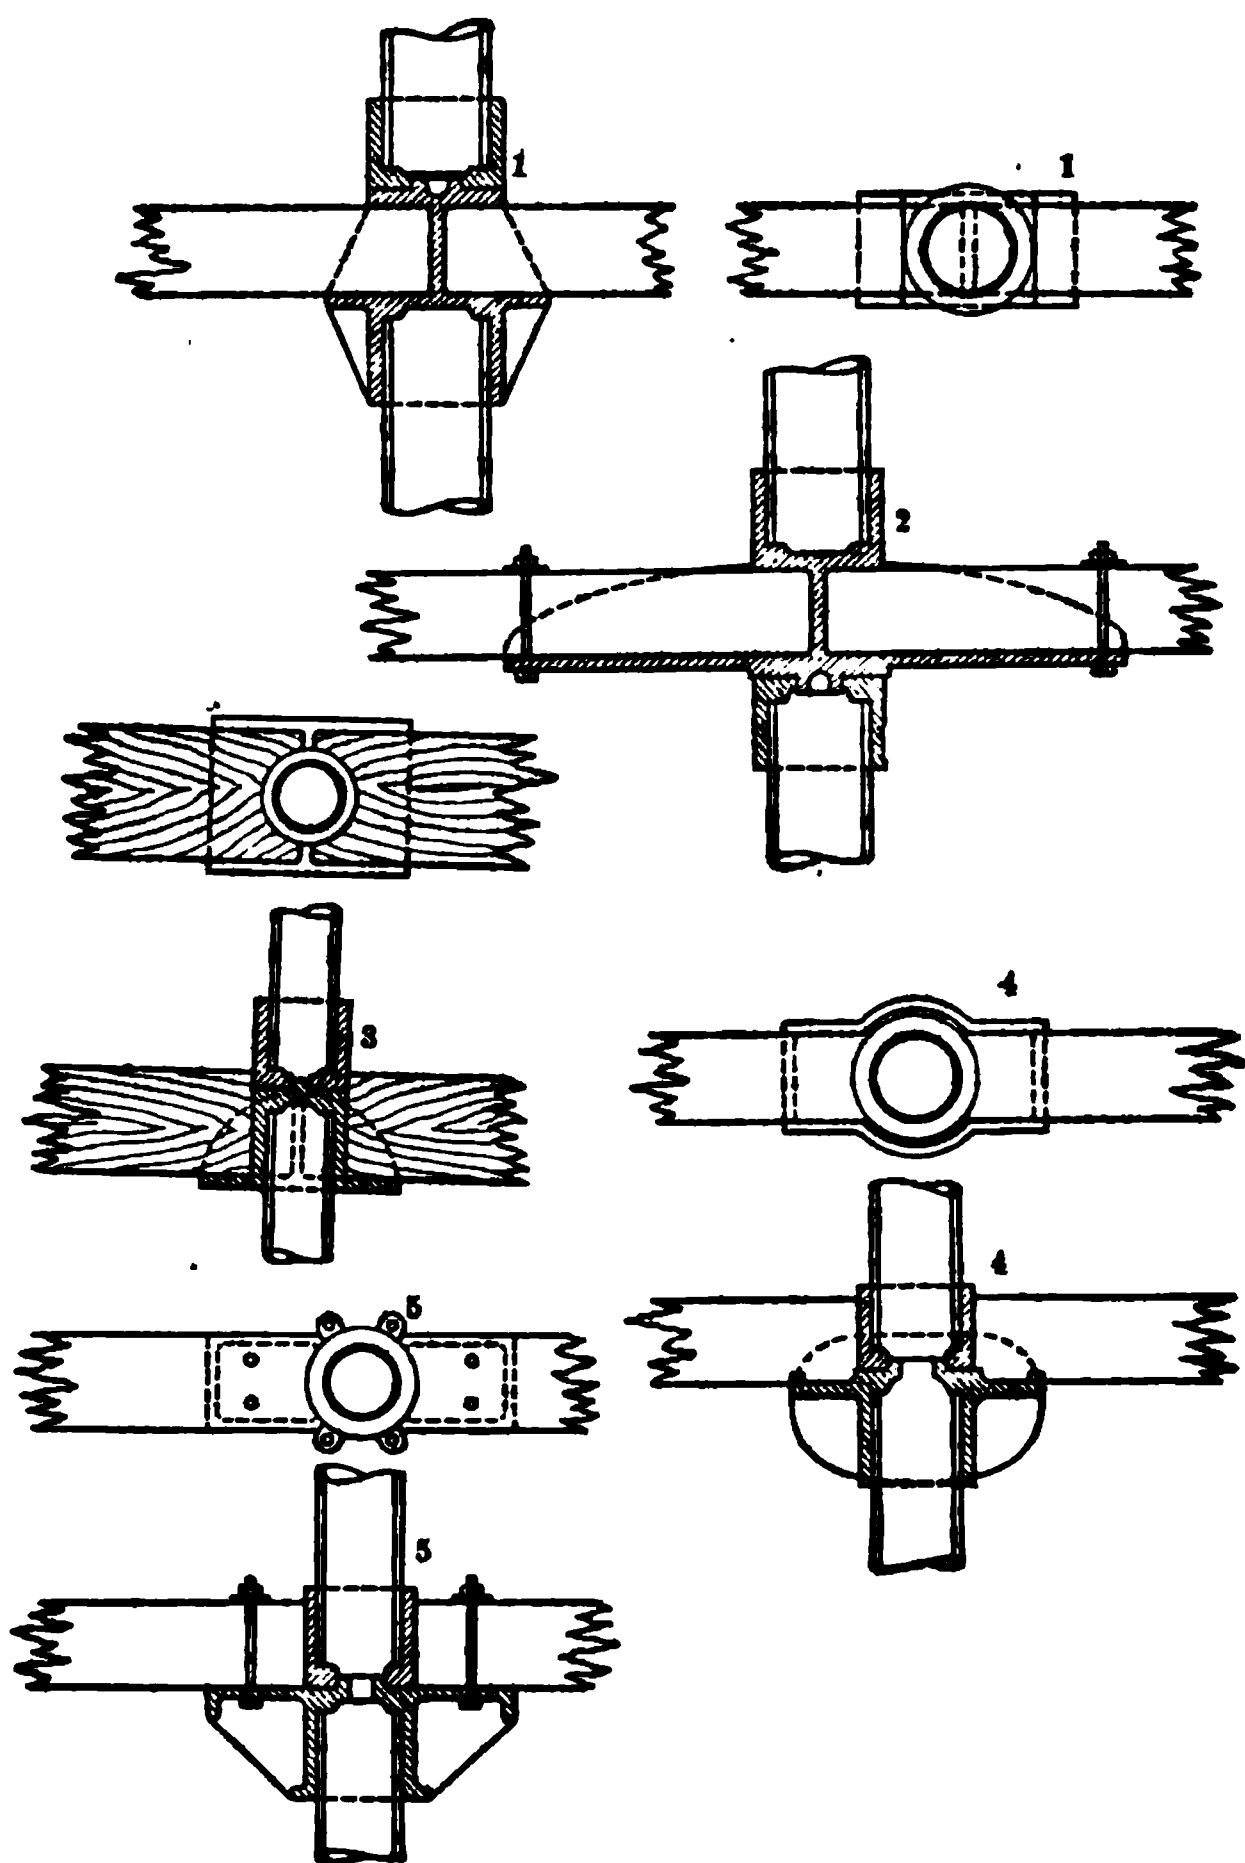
Connections, Caps and Bases for Steel-pipe Columns
